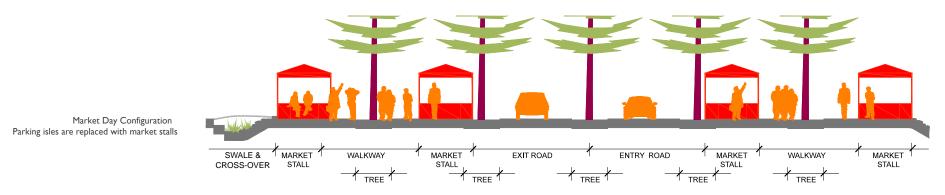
| Indicative cross section through Pier Park space showing possible market activities
